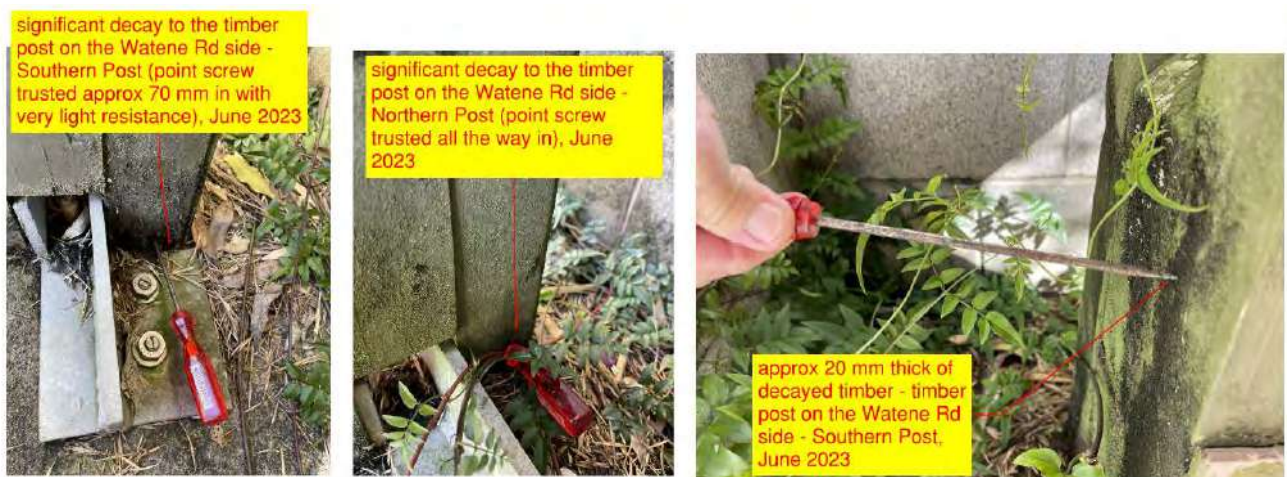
Conditions of timber posts supporting the main horizontal beam – Watene Road end.
